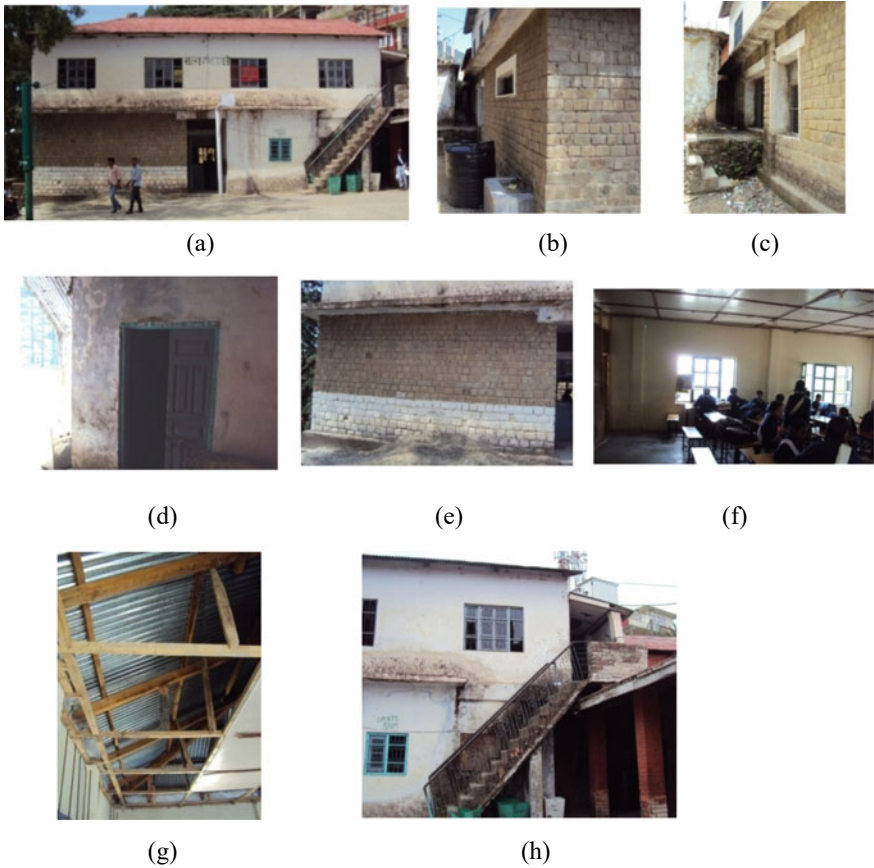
a Block C—front view, b Back side view, c Wall thickness 0.5 m, d Wall—0.115 m, e Slab thickness 0.115 m, f First floor wall 0.115 m, g Wooden roof truss, h Common staircase and landing of Blocks B and C
